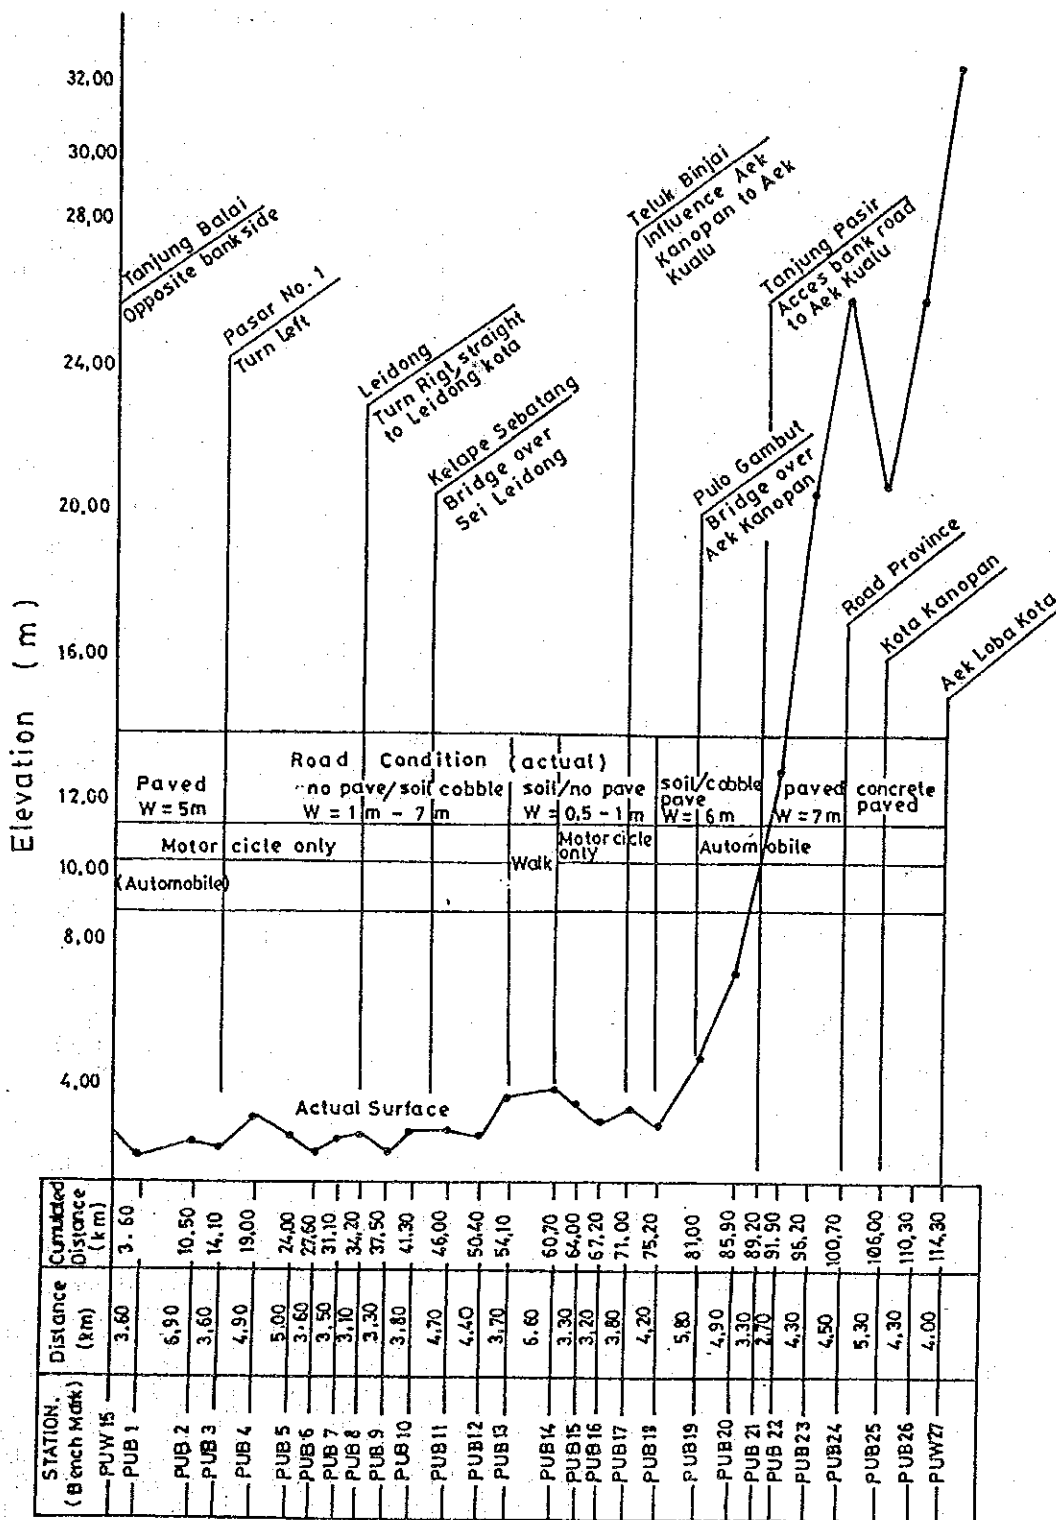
ROAD SURFACE PROFILE OF THE LINK ROAD
